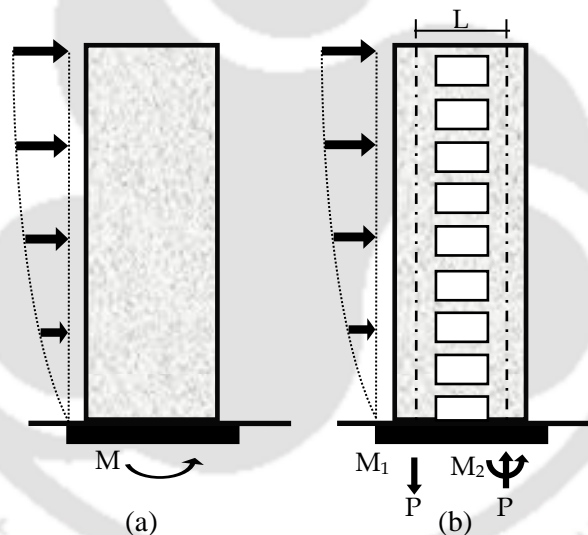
Lateral load resisting mechanism of shear walls: (a) cantilever wall and (b) walls coupled by beams (Paulay and Taylor, 1981).
